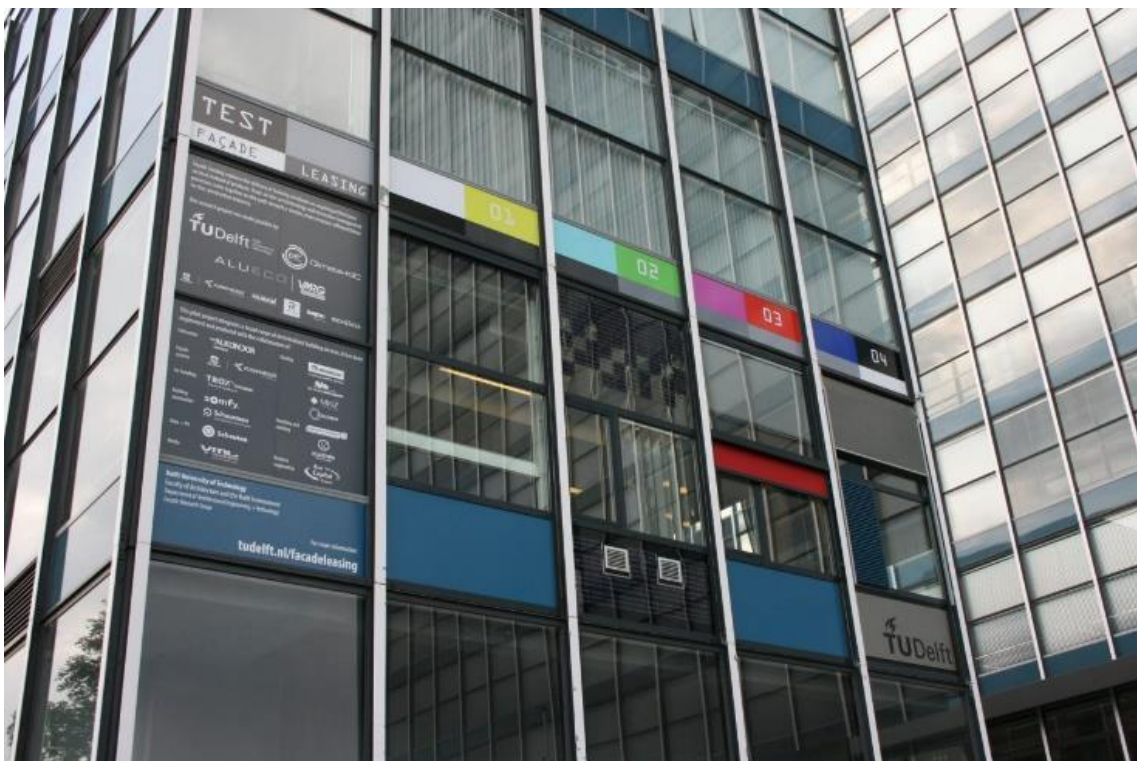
TU Delft façade leasing pilot project (Architectuur.nl, 2016)
